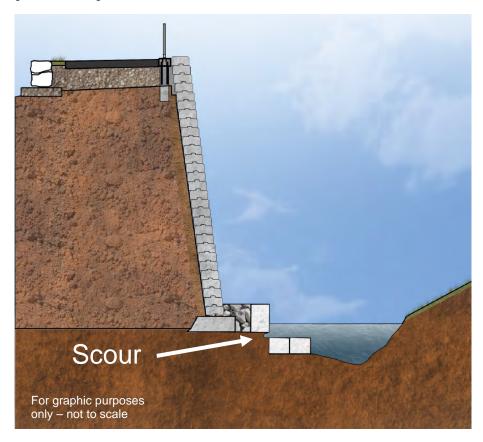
Harris Park Existing Conditions – Cross-Section
